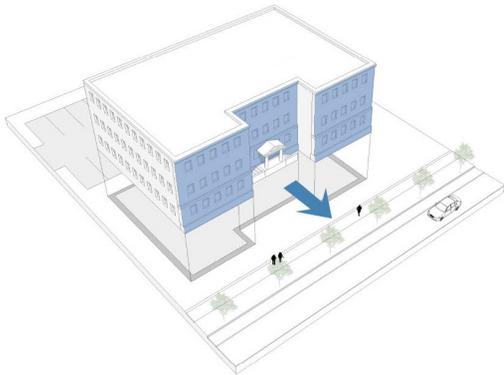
Building (A) and Entry (B) Orientation to the Street
